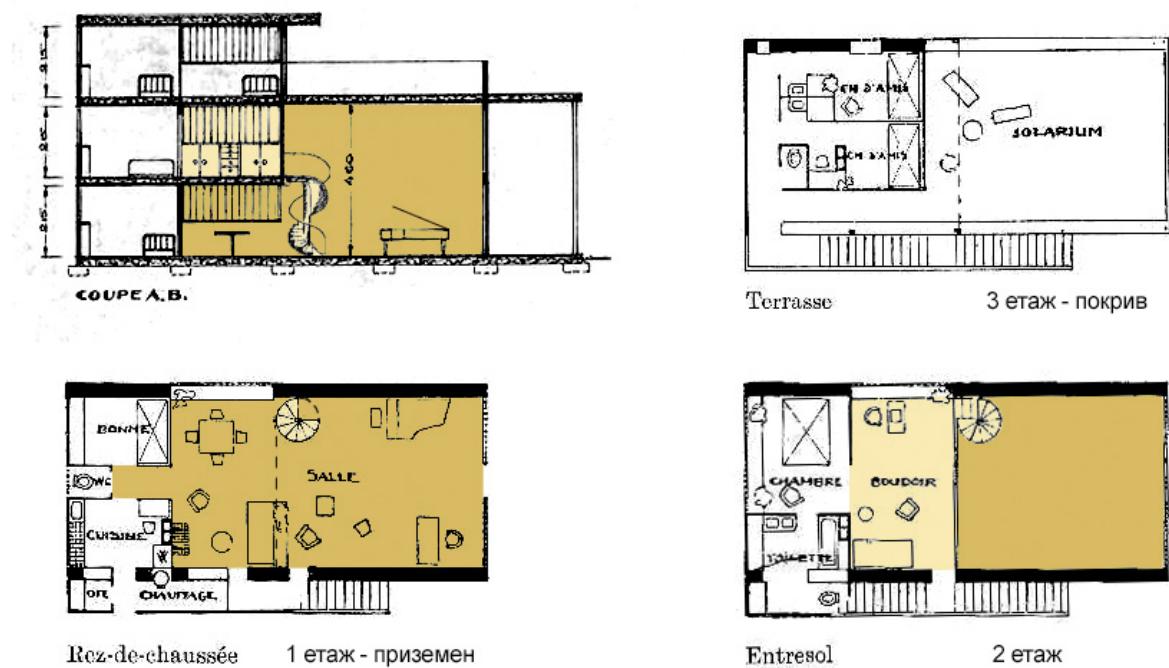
Maison Citrohan I – Floor plans and section © Towards New Architecture
